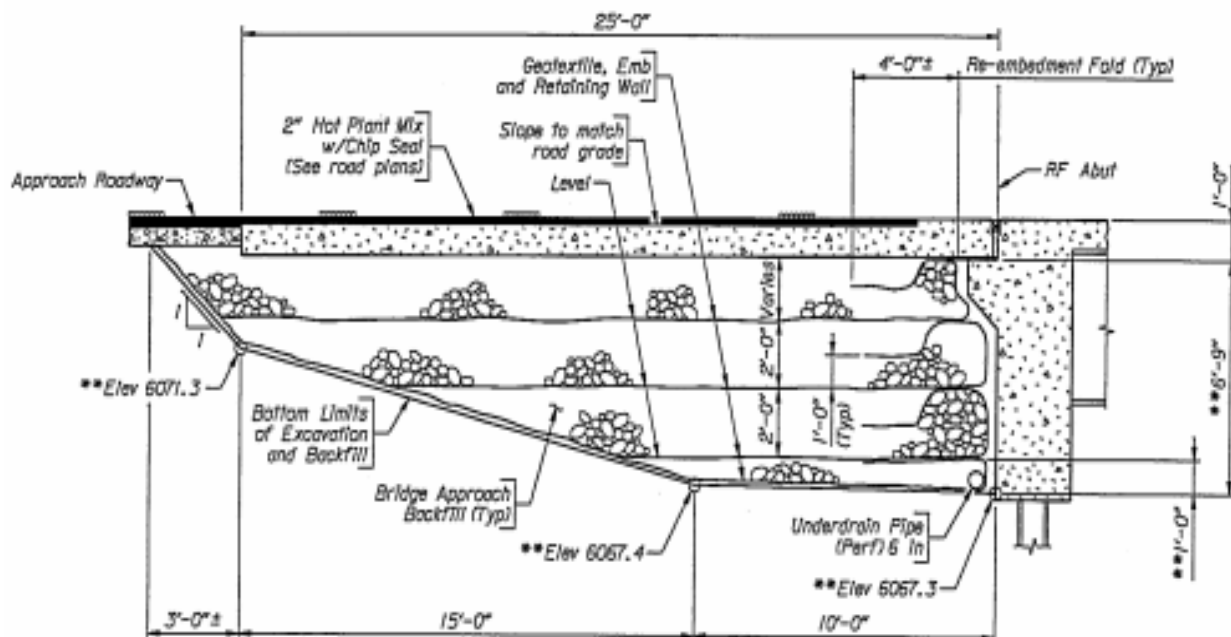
Sectional view of the concrete approach slab with a geotextile reinforced backfill system (Adapted after WYDOT Bridge Applications Manual)
